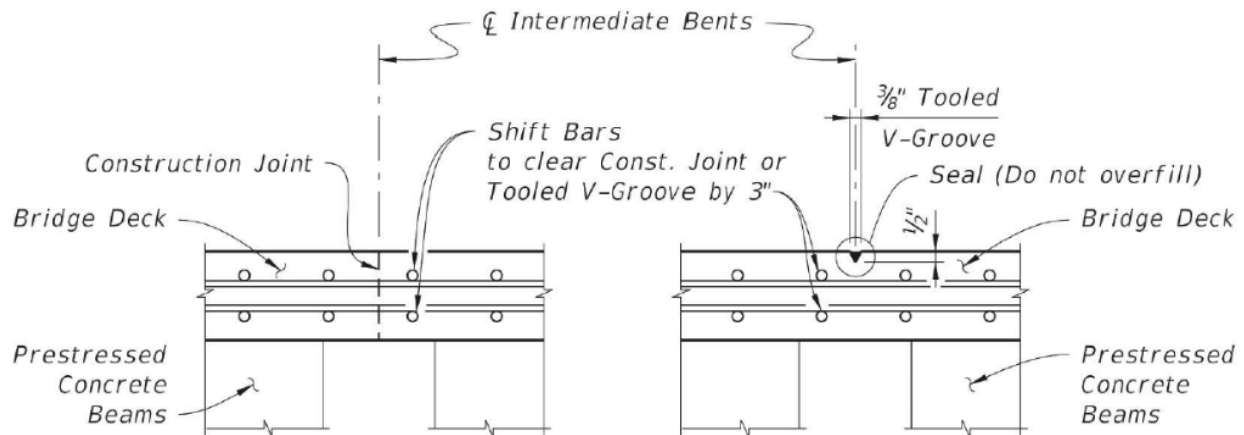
Florida Department of Transportation details for continuous slab over joint between simple spans (Trados, 2016)
